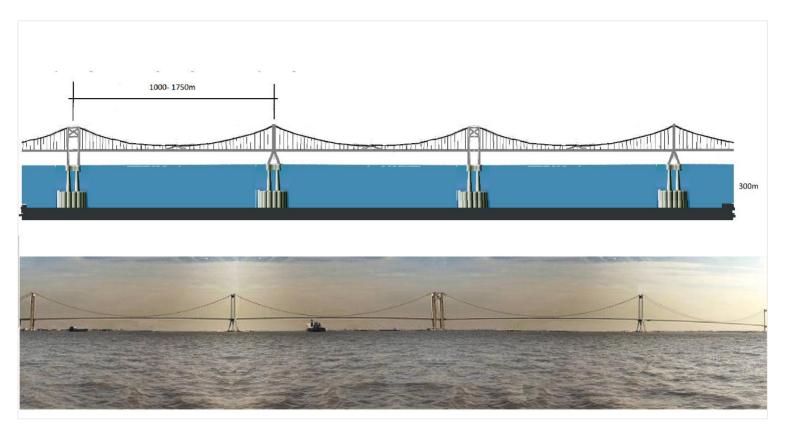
A long span, deep-water, multi span suspension bridge proposal, with gravity platform foundations
